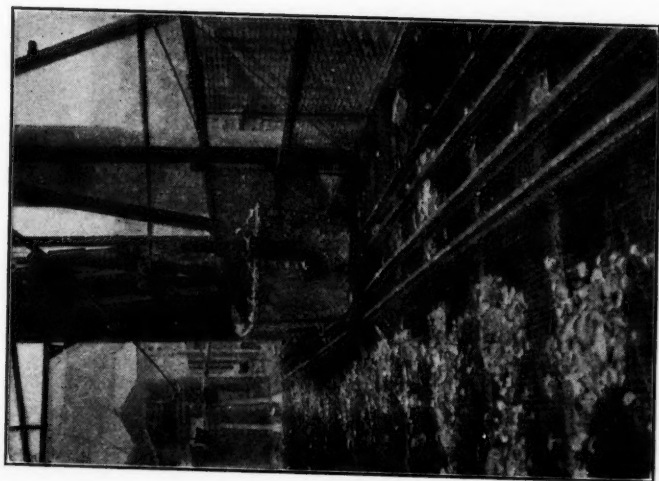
T-RAILS USED FOR GUARD-SCREEN FLOOR.
